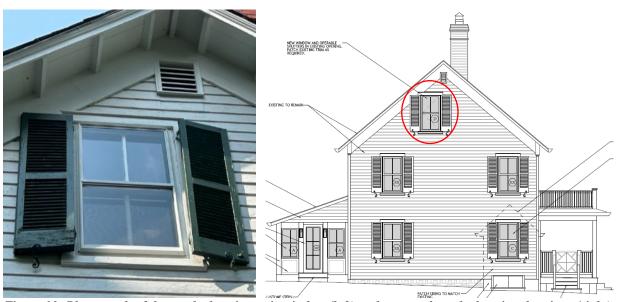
Photograph of the south elevation attic window (left) and proposed south elevation drawings (right). The red circle show the location of the window proposed to be replaced.
